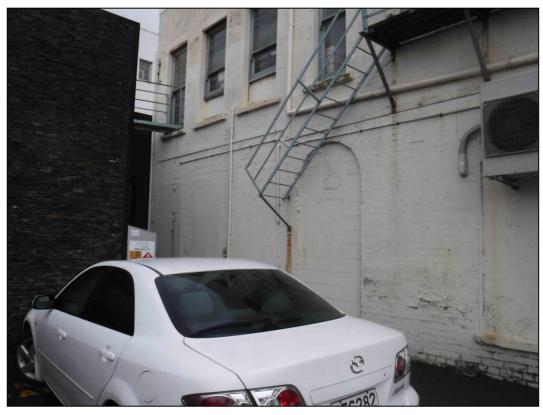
North elevation of Carter's Building, looking southeast. The three sash windows to the left mark the part of the building that may pre-date the rest.
